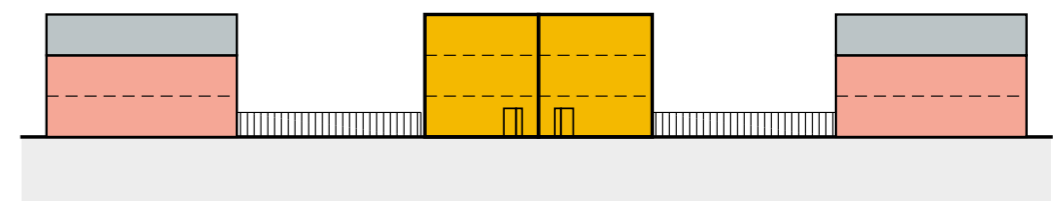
Window positions should be carefully considered to avoid direct overlooking of the first 10m of neighbouring gardens, and the height of new buildings should ensure that adequate daylight and sunlight reaches existing habitable rooms and rear gardens.
